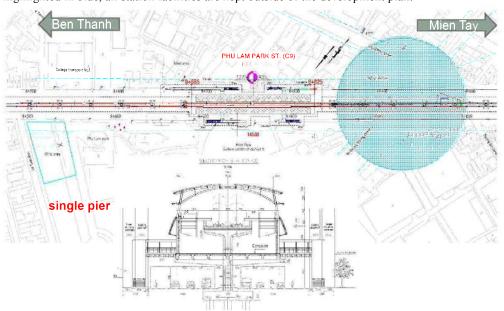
Plan and Profile at C9 Proposed by the JST
